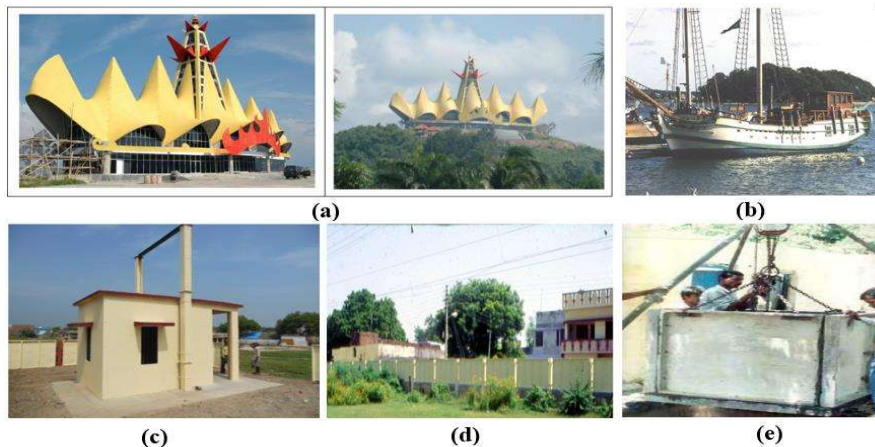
Ferrocement roof of the Siger Landmark, Indonesia; (b) Ferrocement boat LARINDA – replica of 1770's British coastal shoner; (c) Pump House in Sultanpur U.P. (d). Boundry Wall in Prayagraj; (e). Sewage Plant Sultanpur (U.P.)
